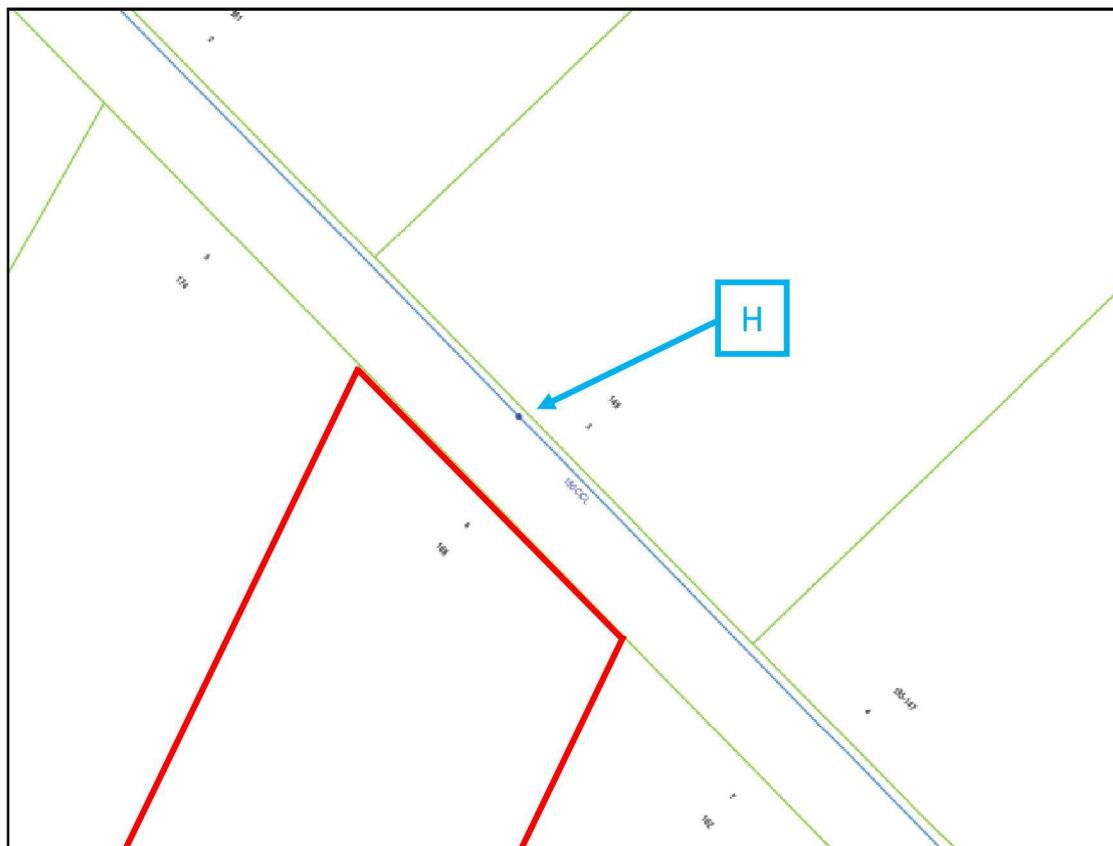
Section Sydney Water Reticulated Mains Water Supply Layout Plans
